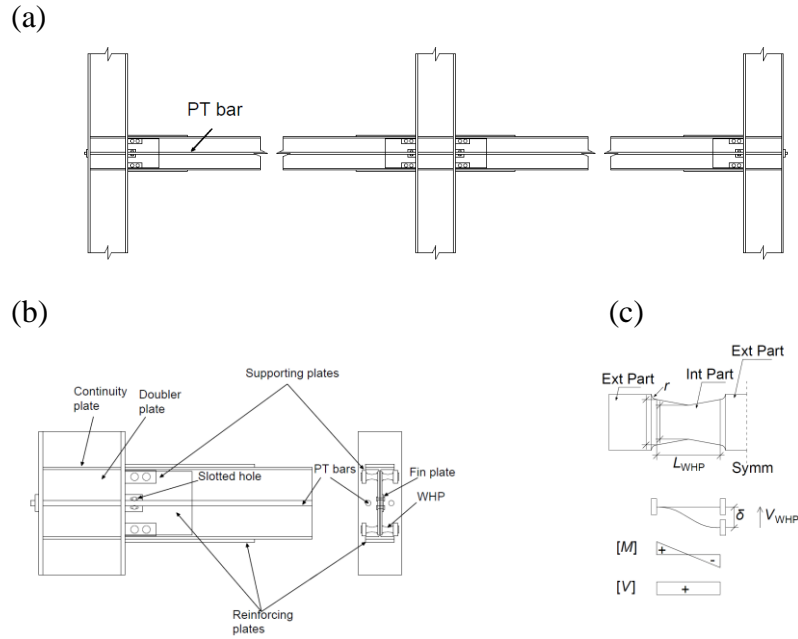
a) SC-MRF; b) exterior PT connection with WHPs; and c) half WHP geometry and assumed static system.
